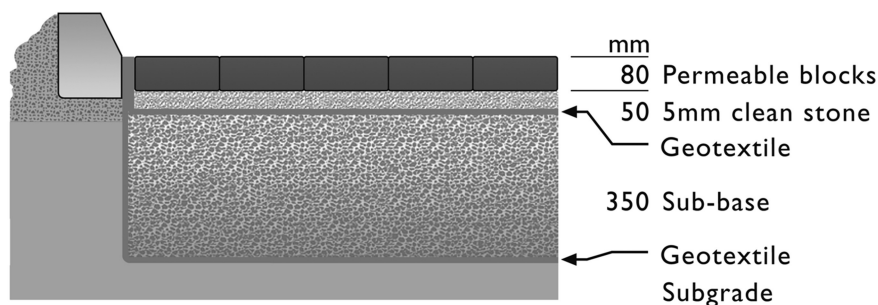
Layout of a permeable pavement system with concrete paver surface and permeable clean stone and sub-base (typical for the United Kingdom)
